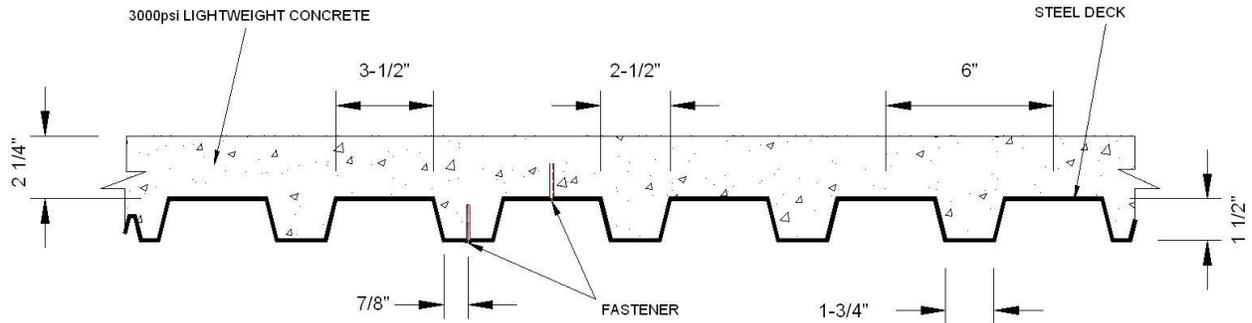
FASTENER INSTALLATION SAND-LIGHTWEIGHT CONCRETE FILLED “B” STEEL DECK
